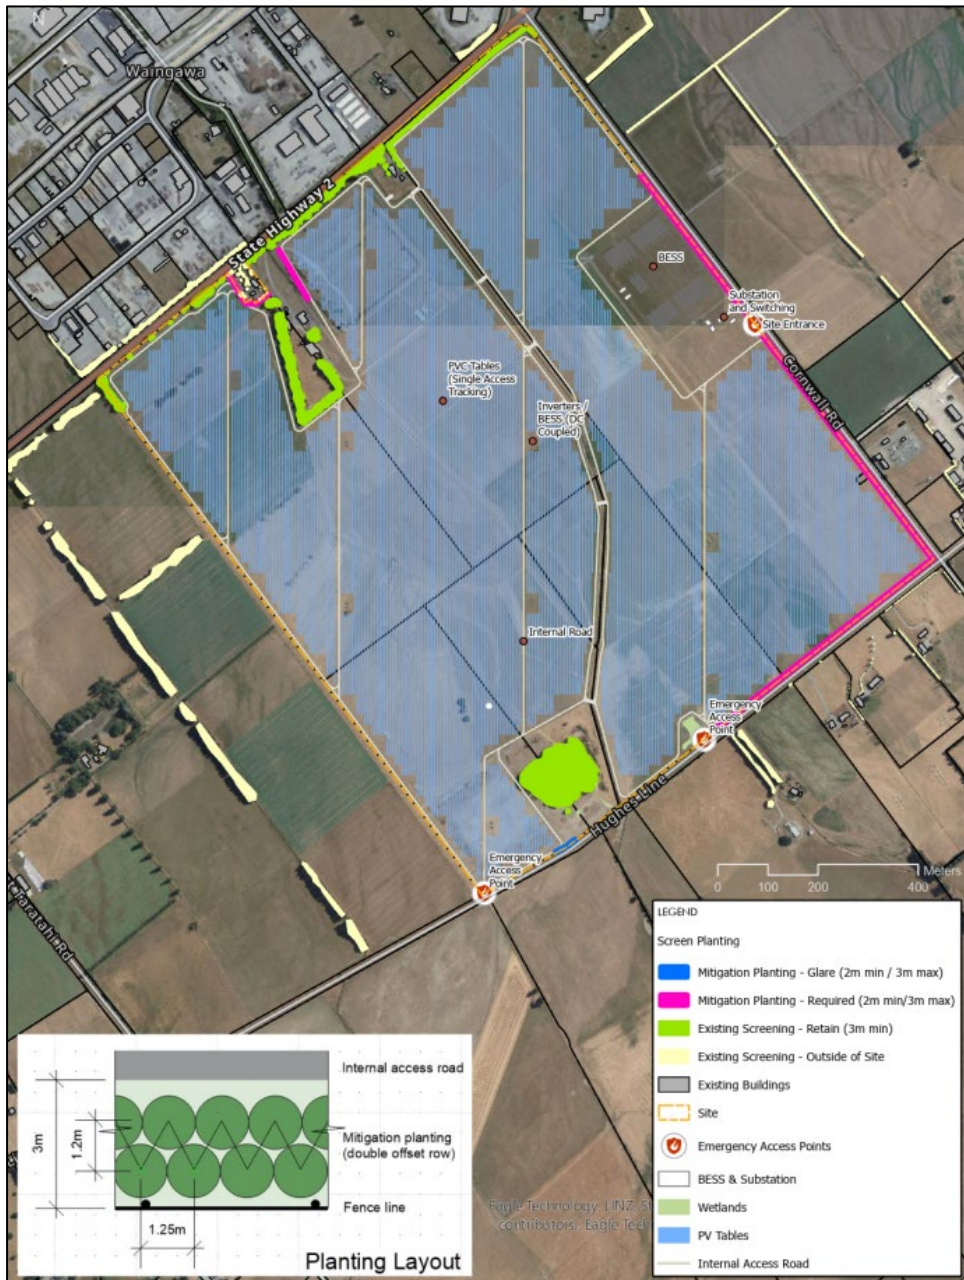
Proposed mitigation planting plan (Mansergh Graham Landscape Architects).
